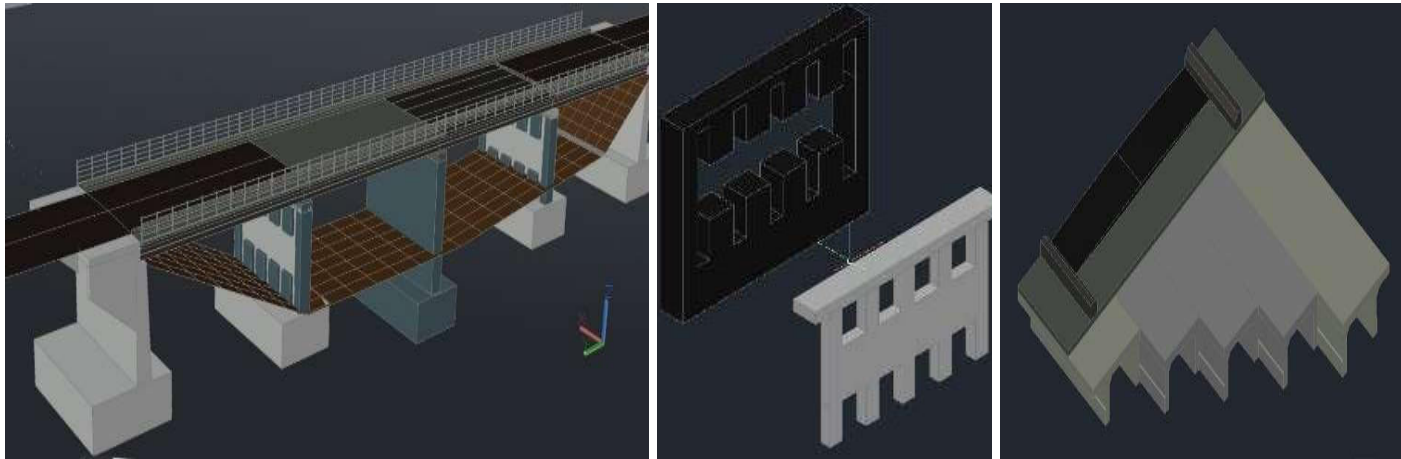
Some exercise for use of existing precast members and strengthening by Jacketing.
